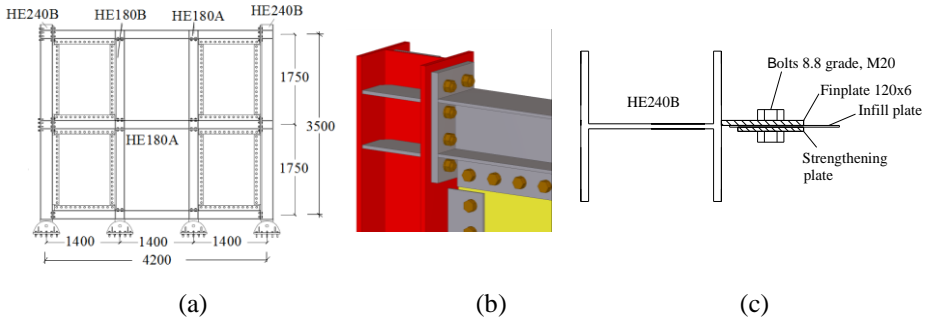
a) Experimental specimen; b) beam-to-column joint; c) plate to boundary elements connection
